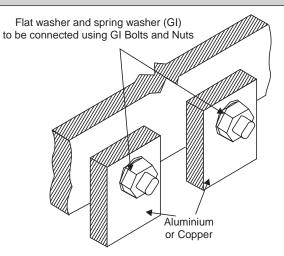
Arrangement of strip to strip and strip to equipment connection
